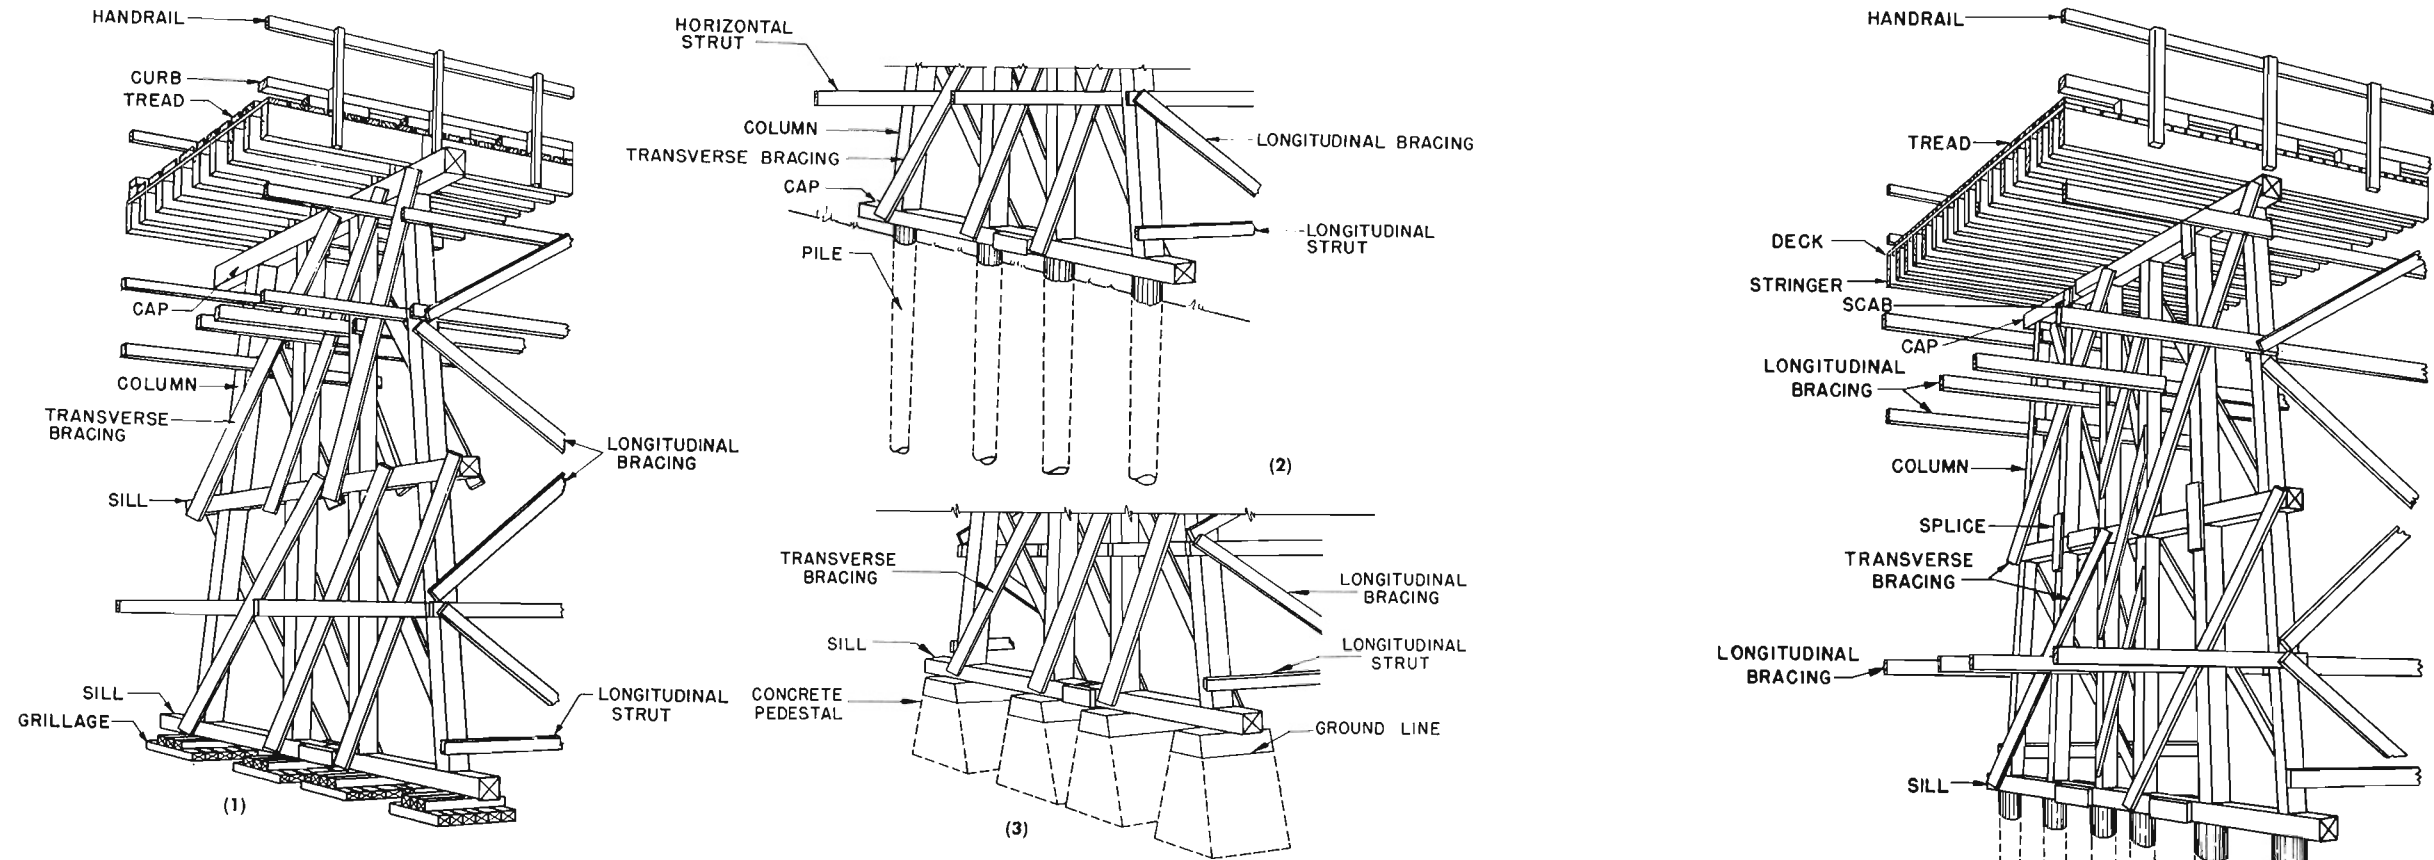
Highway bridge, class 50, single-lane, timber stringer spans, framed timber tower:
